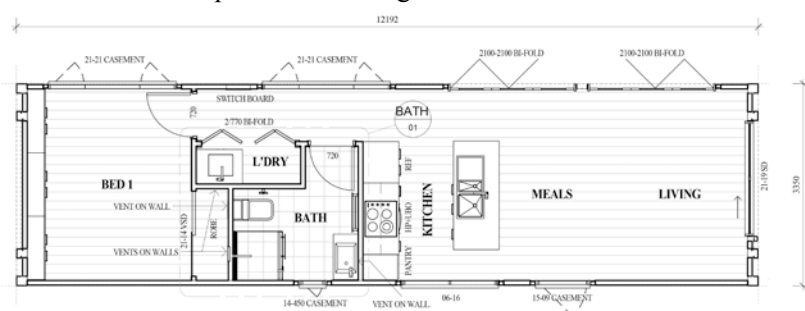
Floor plan of Samara Pod Base Model (Source: Nova Deko)
